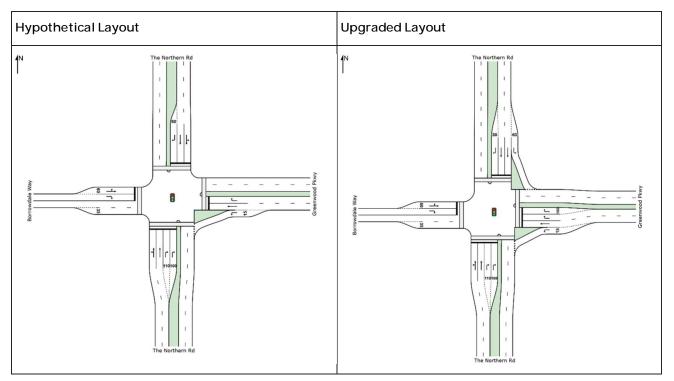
2031 with Links Road extension - The Northern Road/Borrowdale Way/Greenwood Parkway
